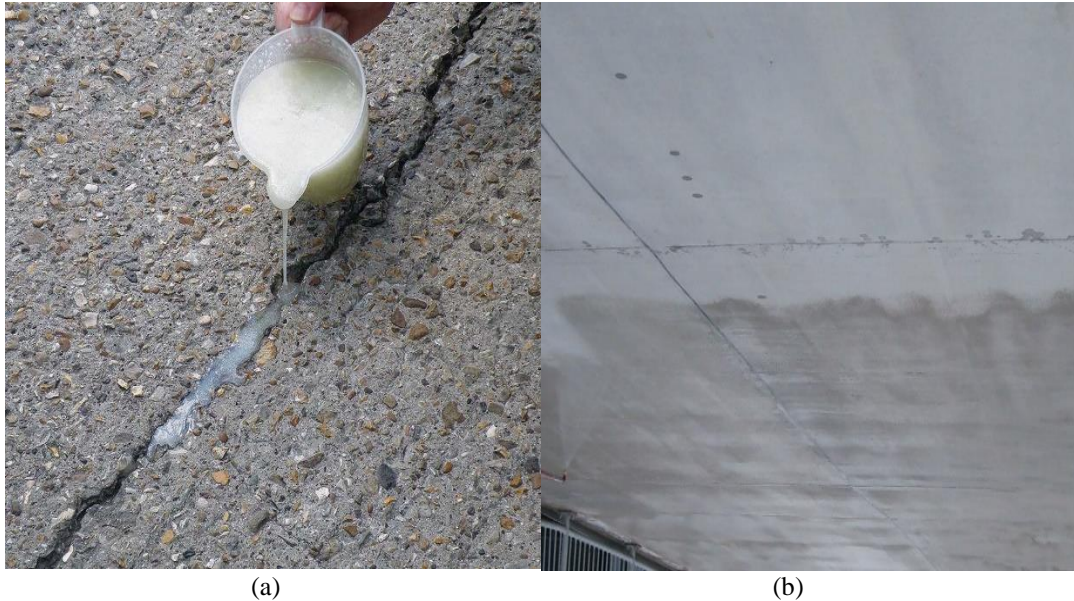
(a) Concrete crack filler, and (b) concrete crack sealant
